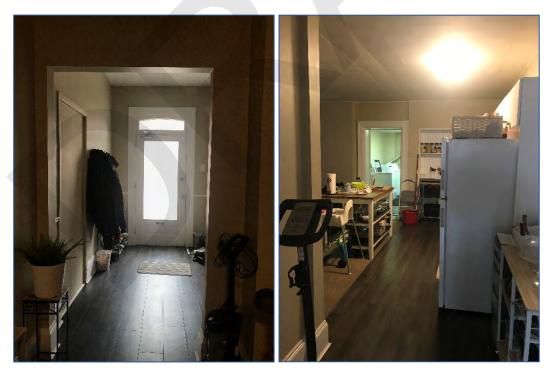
View of floor layout (left), kitchen from front entrance (right)
